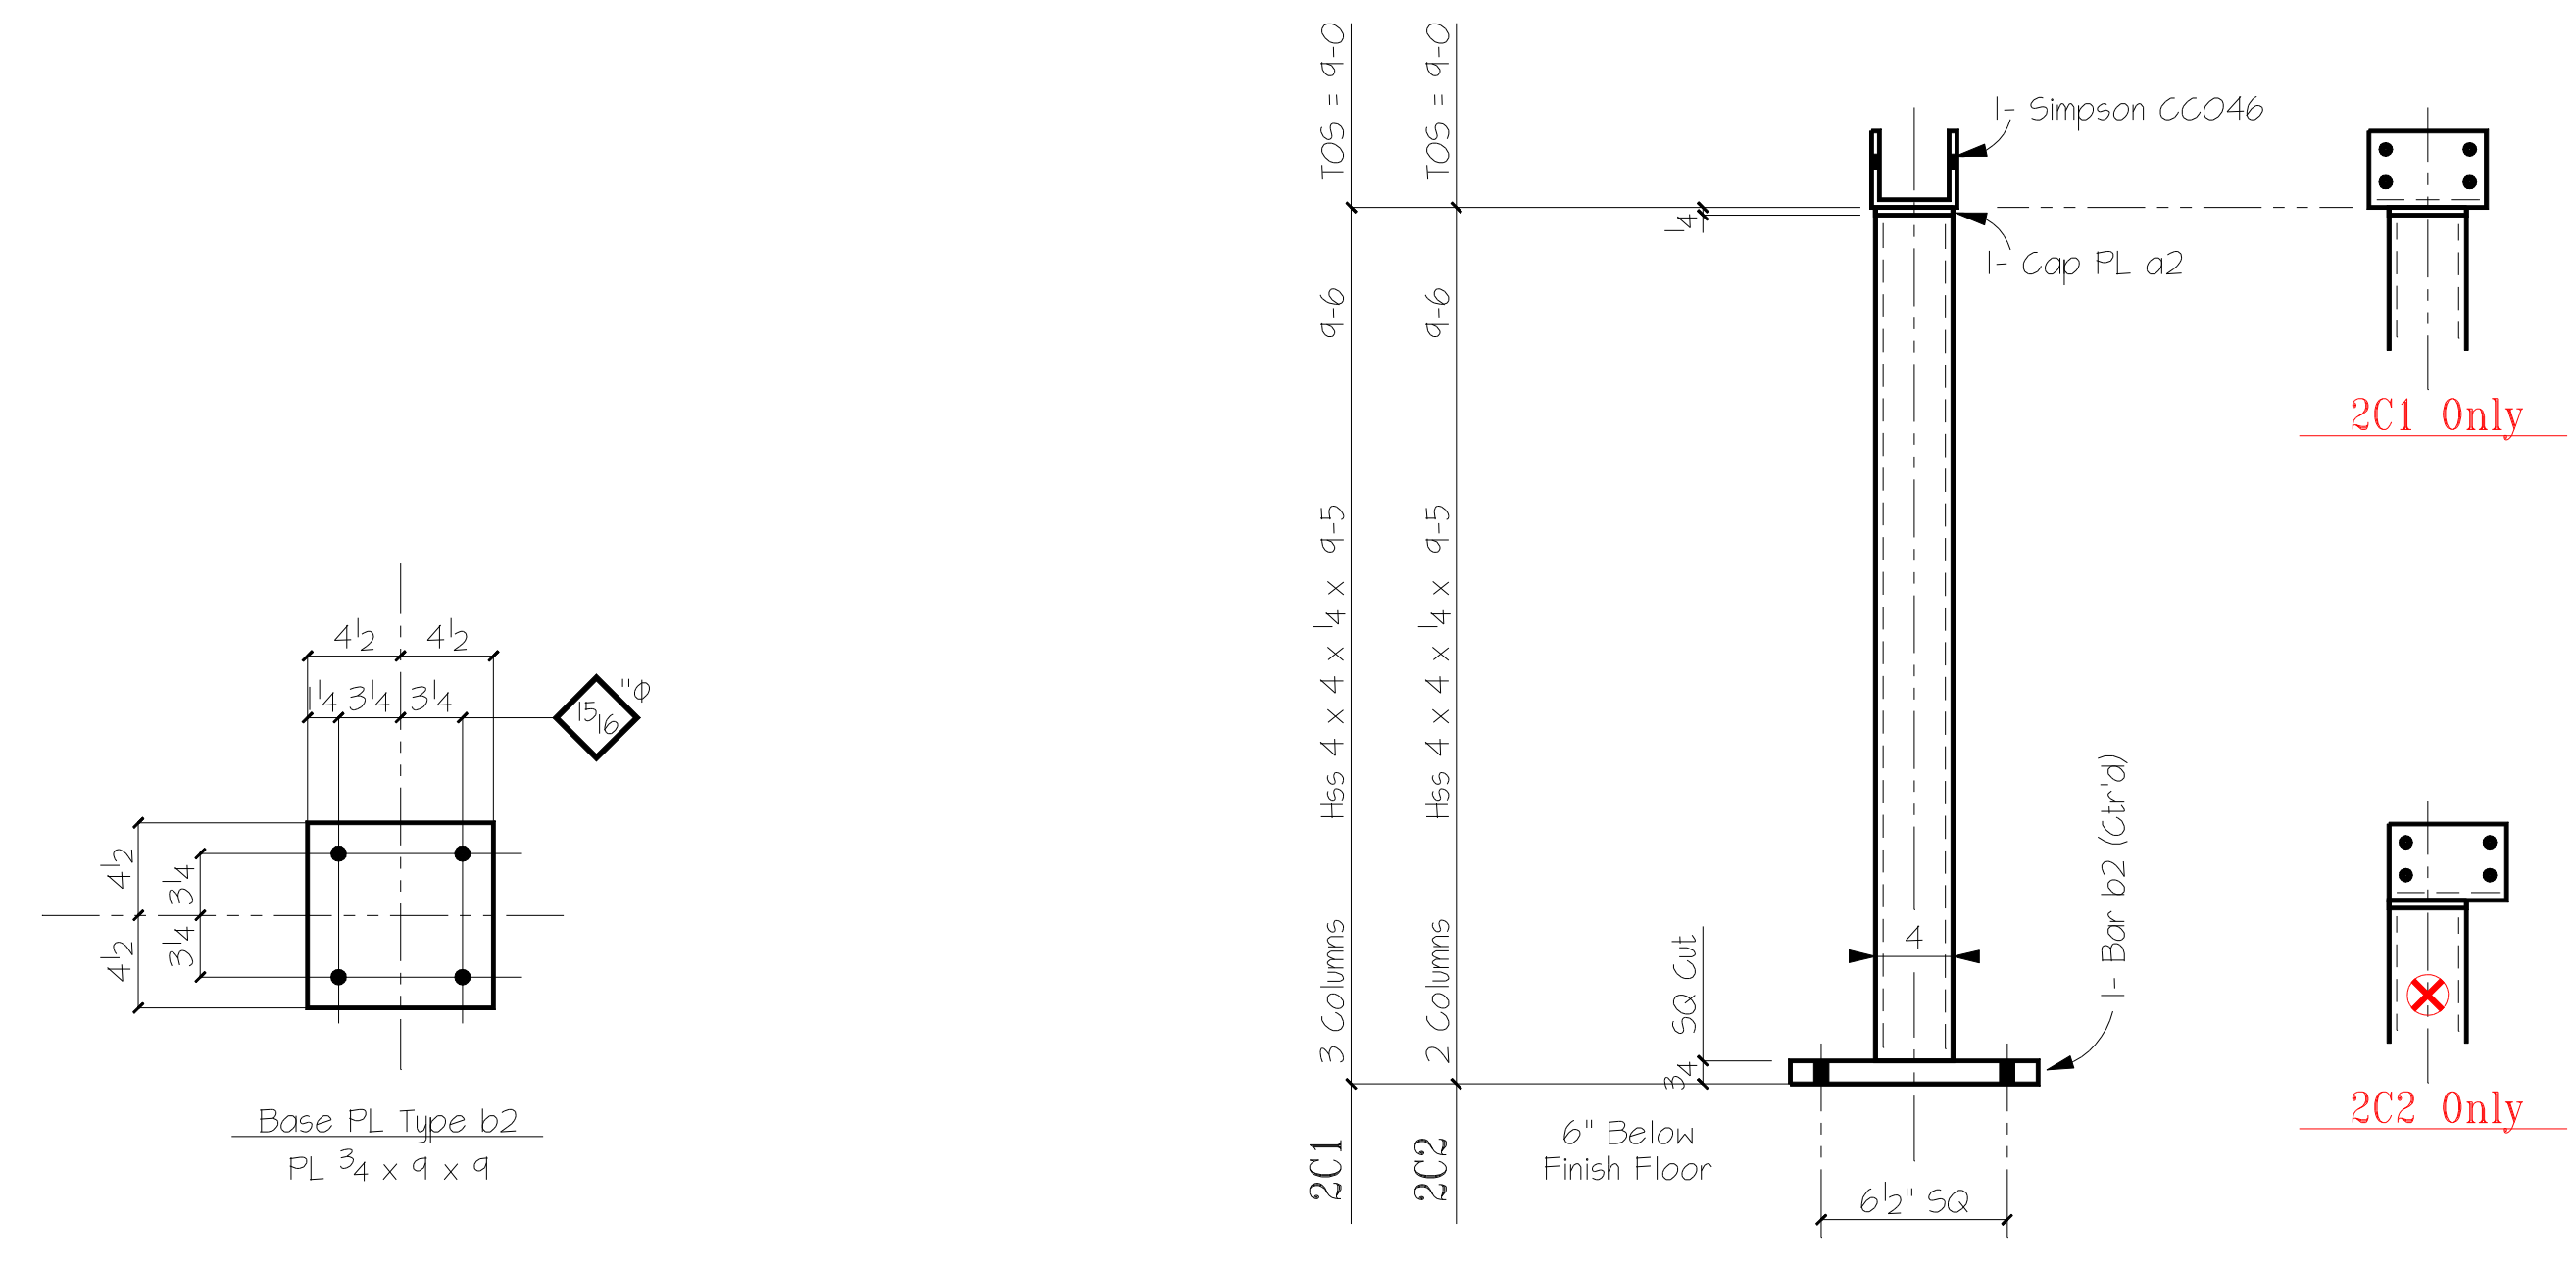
JOB # CW 1303 SHEET # D1
